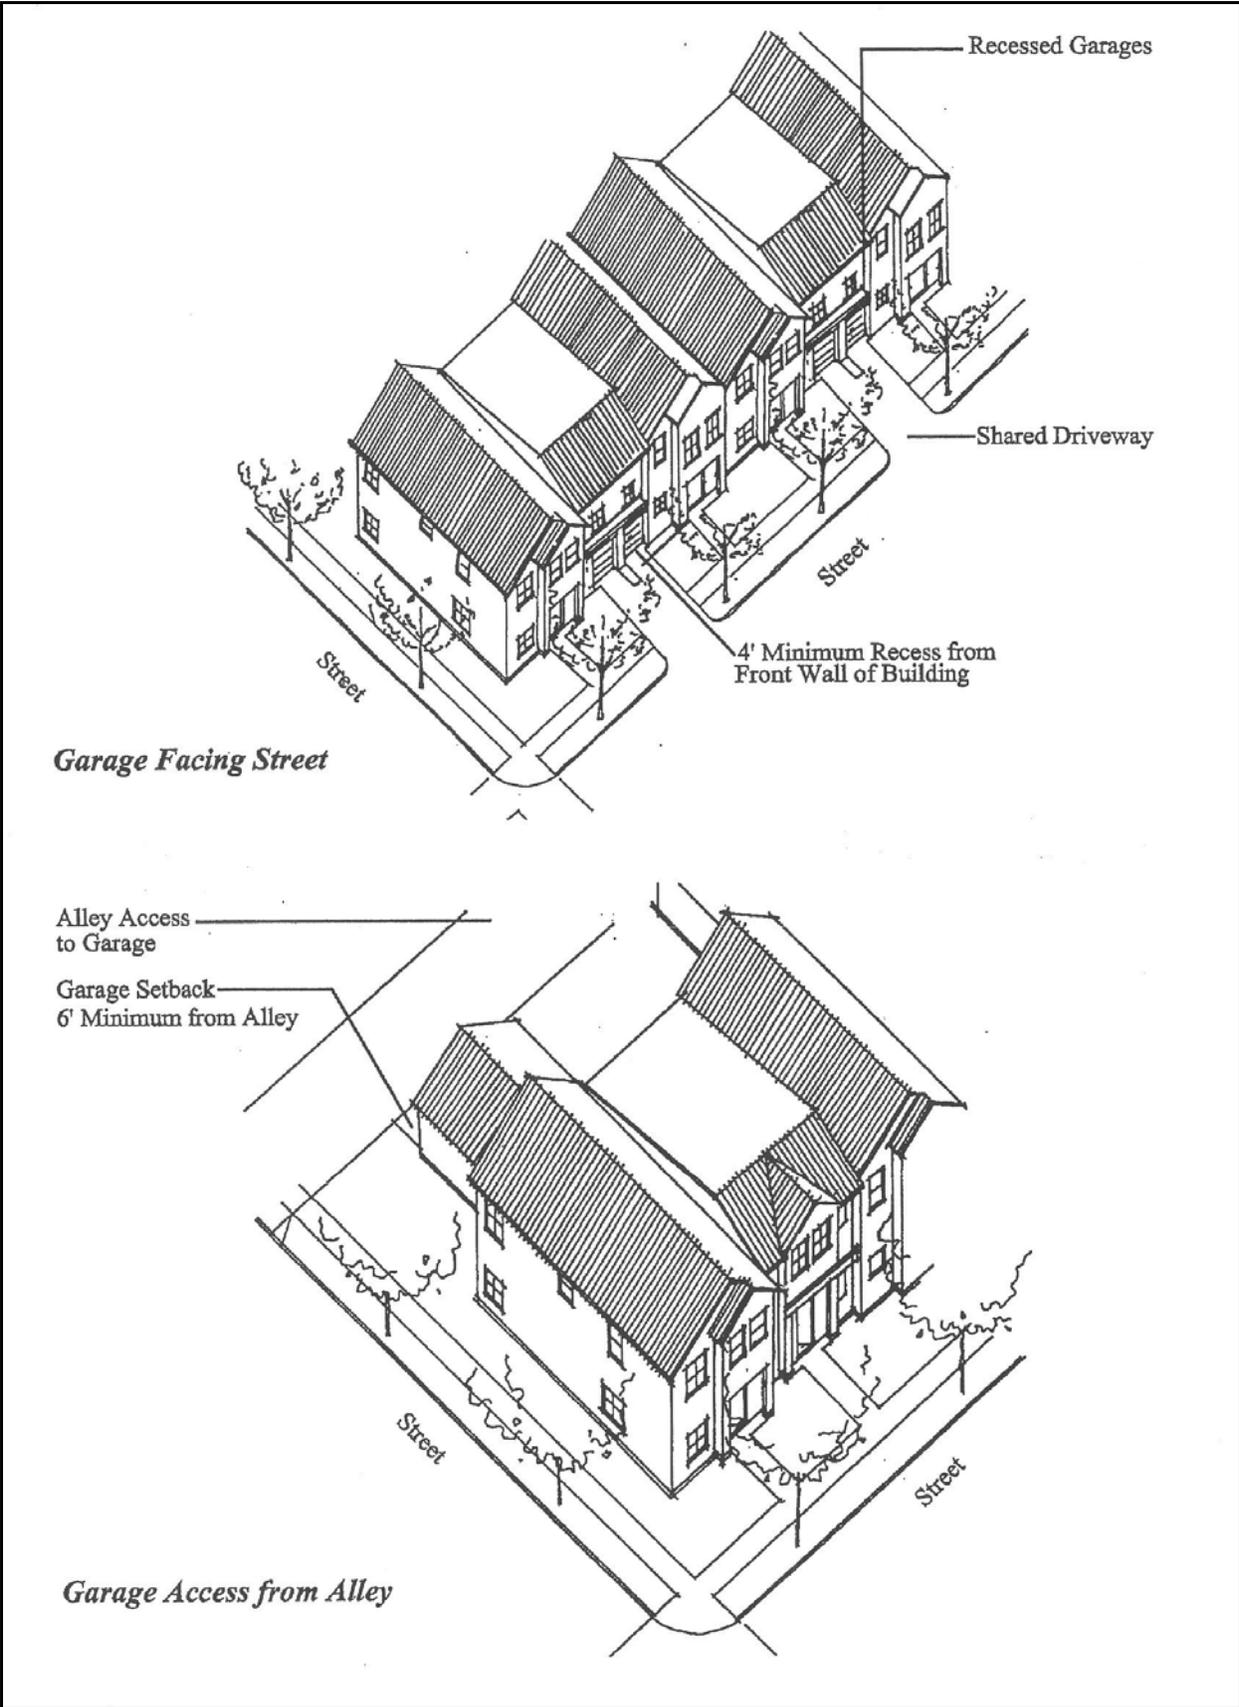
Garage Facing Street and Recessed at Least Four Ft.; and Figure 4.10-6 - Garage with Alley Access
